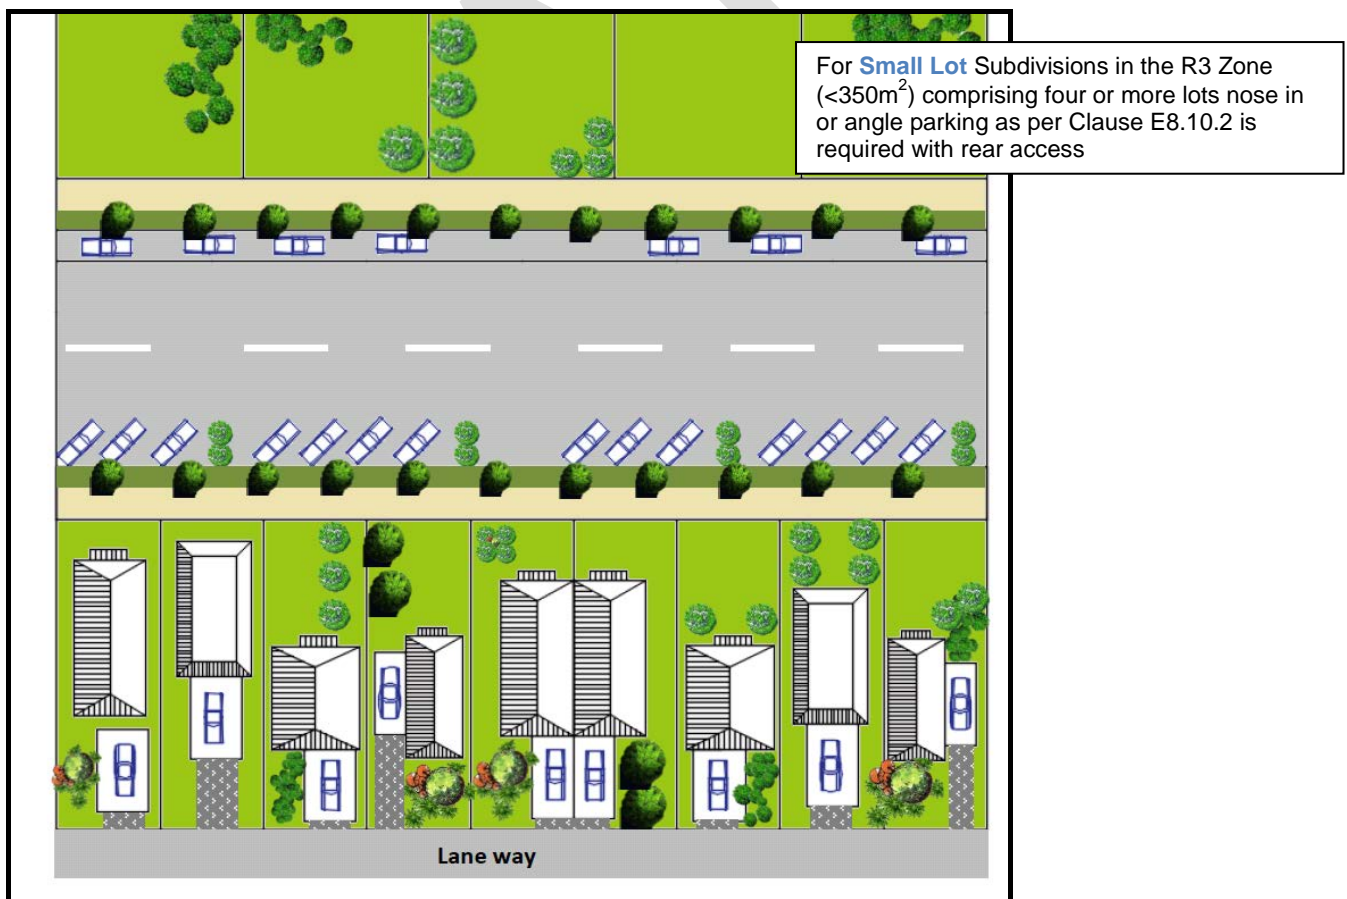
Road and parking design combined with vacant small lot subdivision
